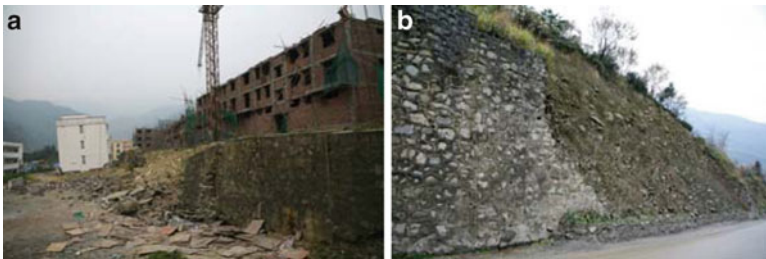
Failures of mason retaining wall (a) Xuankou town. (b) Highway G213 near Yingxiu town
